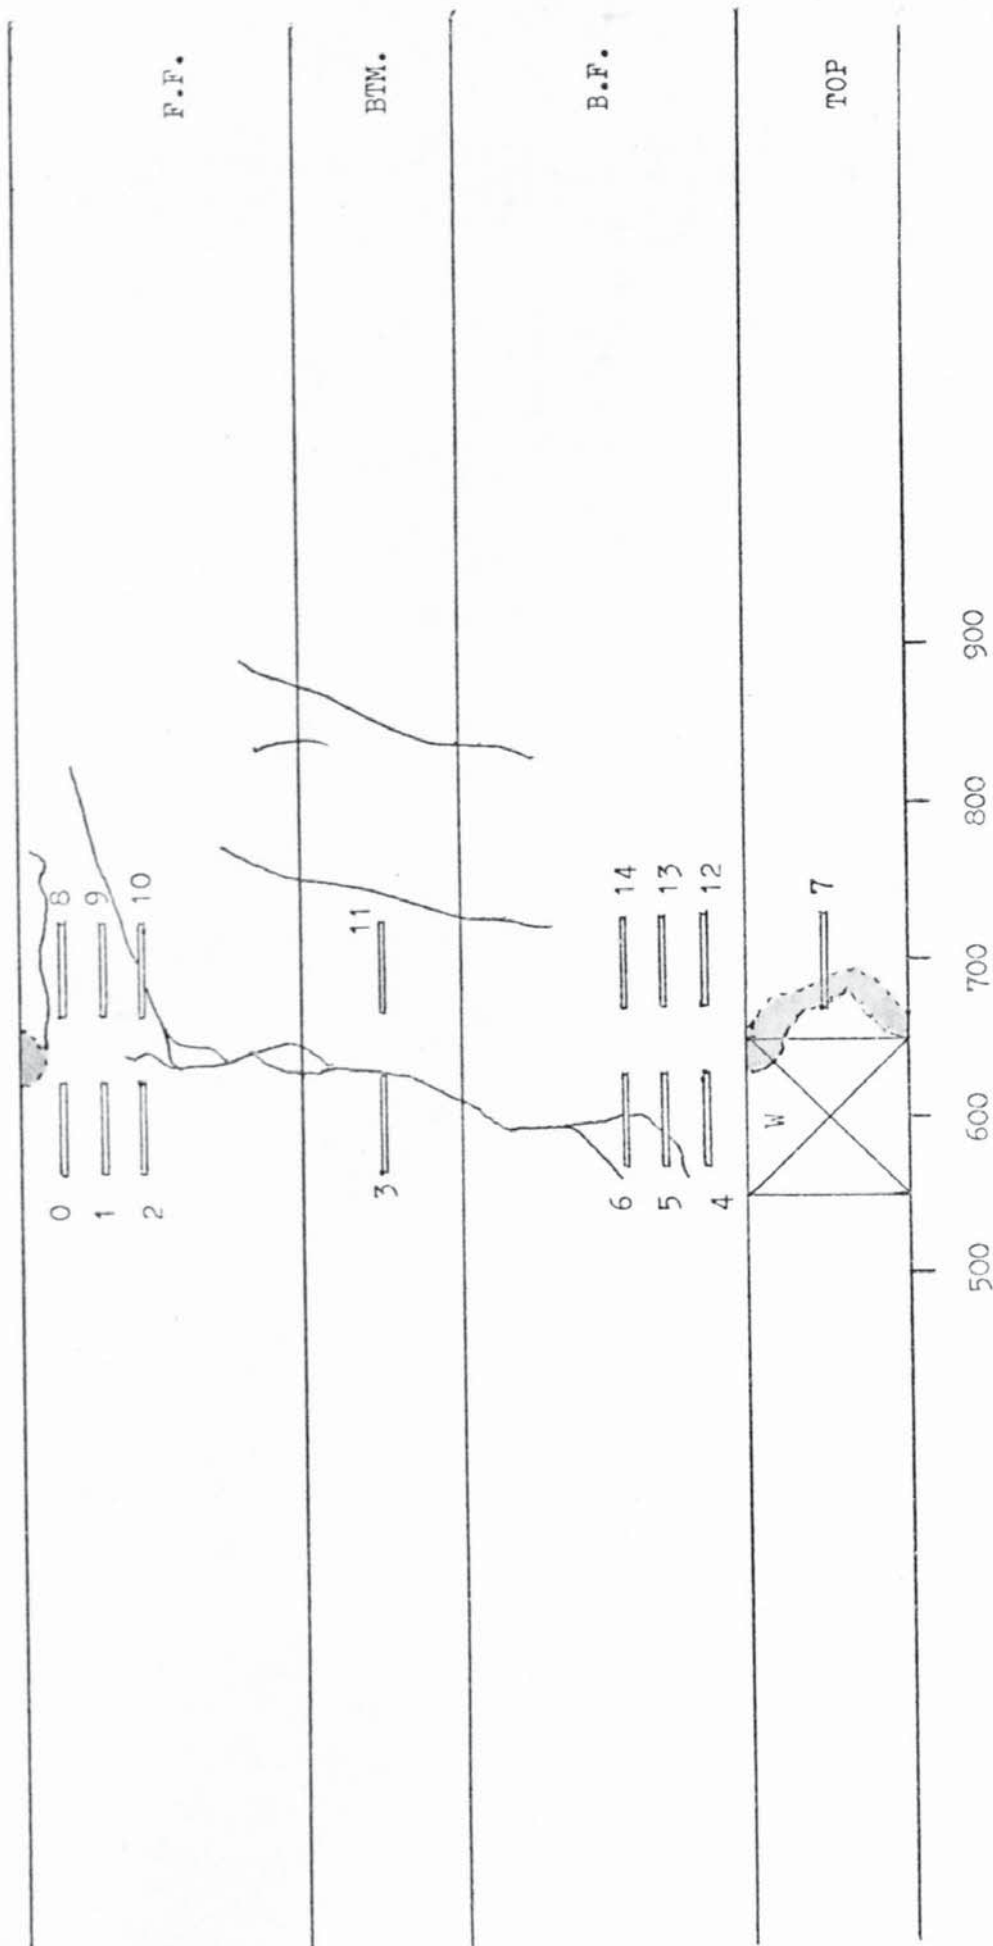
FAILURE CRACK PATTERNS - BEAM 29 ( MODE 1 )
